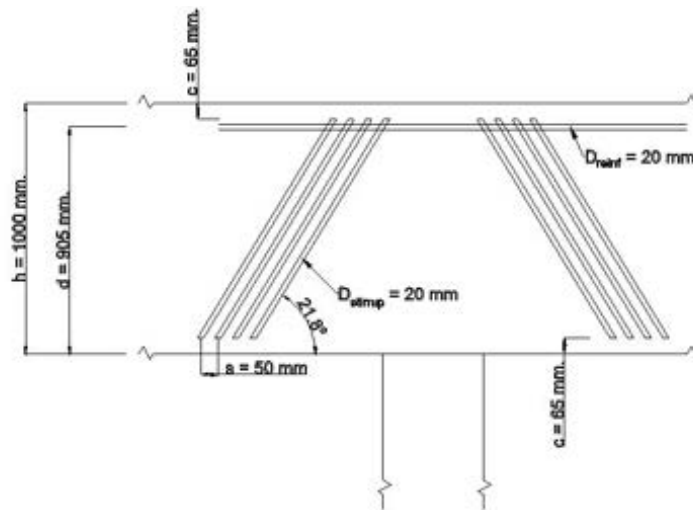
Reinforcement needed to resist the design shear force. Horizontal cut of the water-retaining wall. Notice that the angle is not represented with its actual tilting to better fit the bars.
